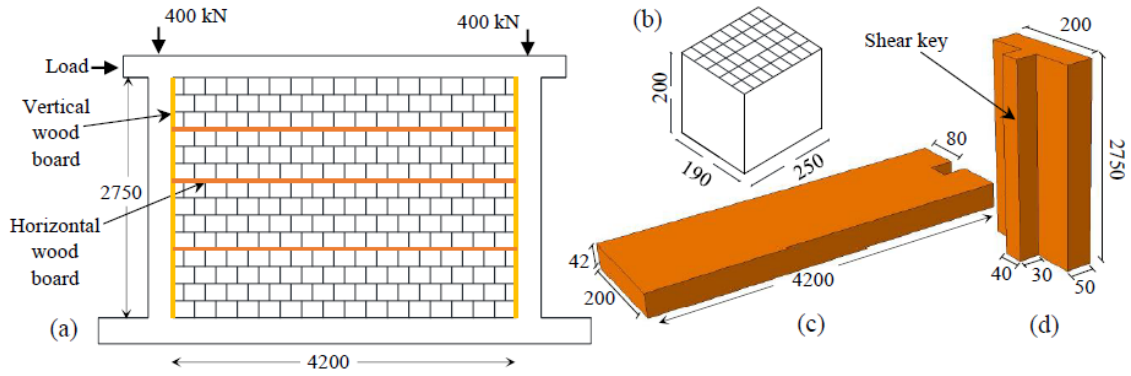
Infilled frame incorporating the proposed construction technique showing the connection details (a) Infill with sliding mechanism, (b) hollow clay brick, (c) horizontal wooden board, and (d) lateral wooden board (measures in mm).
